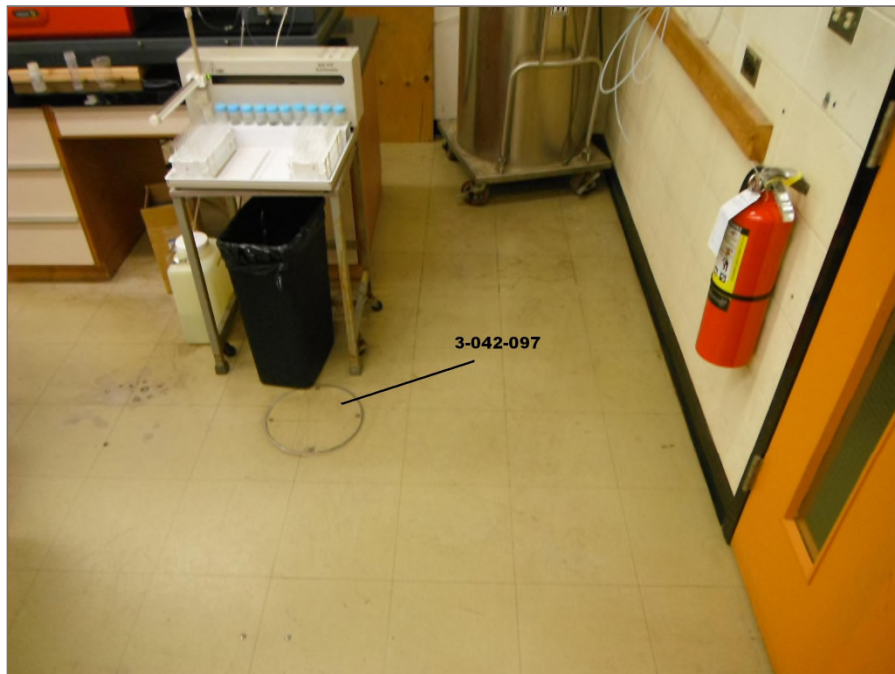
Asbestos-containing 12"x12" greenish with white vinyl floor tiles within a third floor laboratory. Tetra Tech sample 3-042-097.
